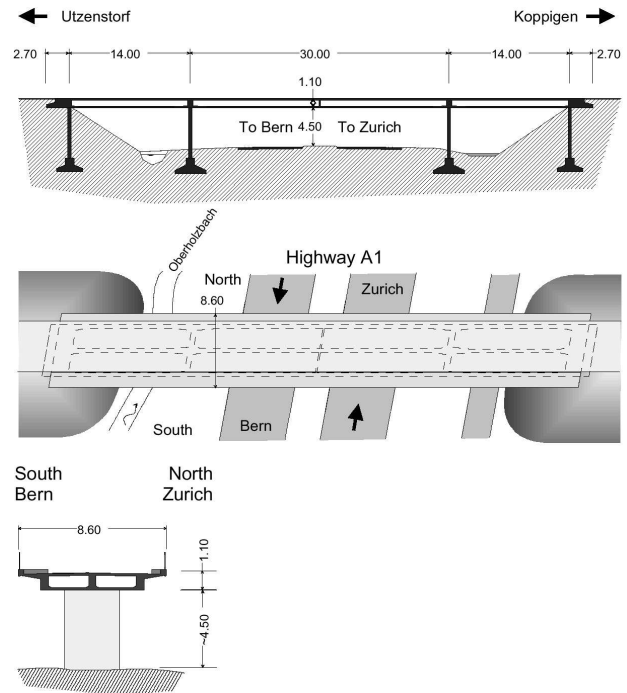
Top view, cross section, elevation (Kramer et al. [11]).
